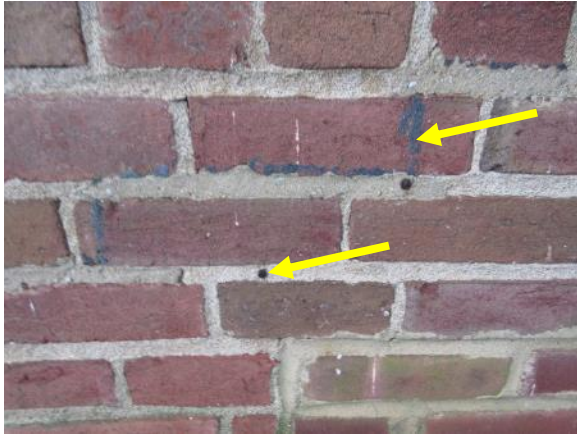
Residual sealant and fasteners at location of previously attached porch on east facade, above current glass porch addition.
